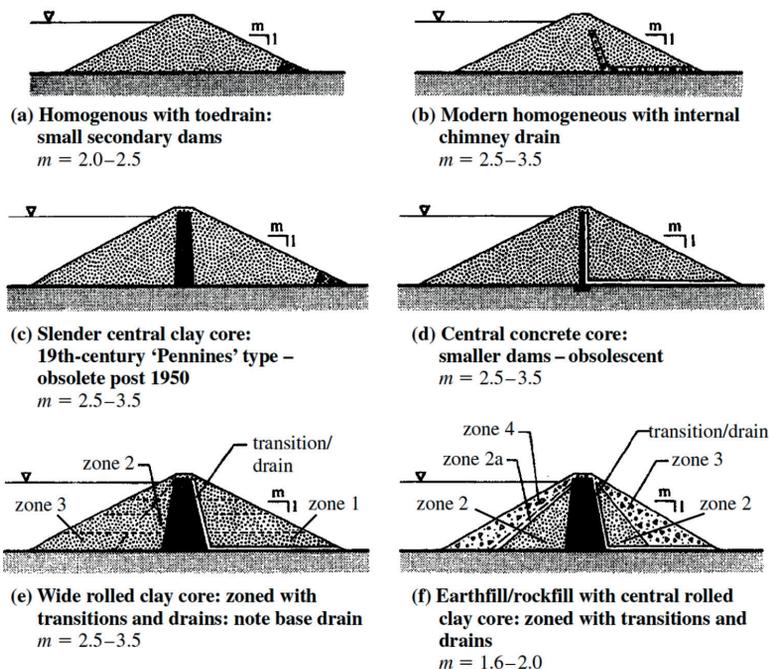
Typical dam or levee cross-sections, simplest (a) to most complex (f) [22]
